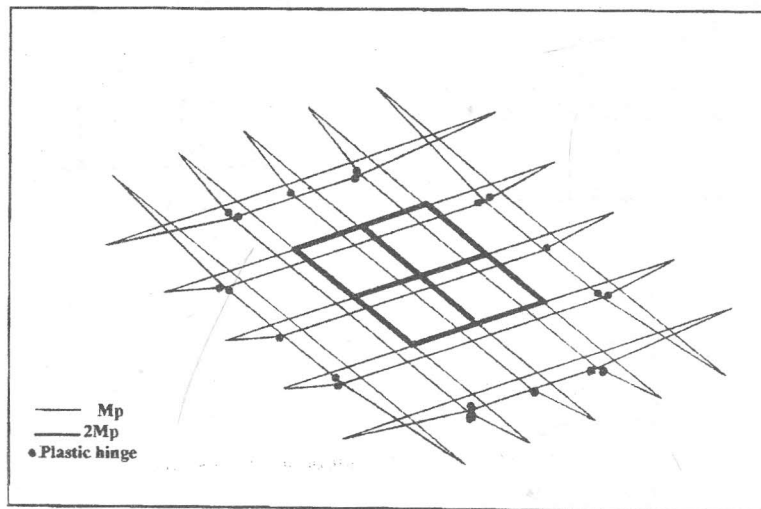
Mode of collapse of the floor (20% of the floor beams are reinforced)
